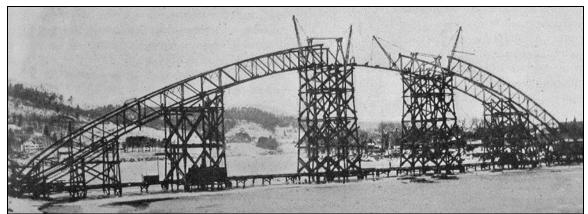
Arch Bridge under construction, winter 1904-1905 (The Engineering Record 1905).
